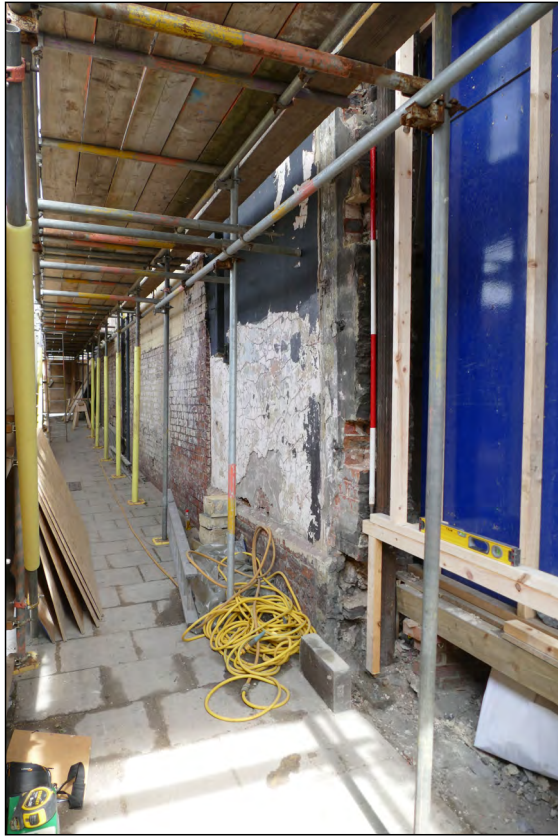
Ground floor exterior, view looking NNW from near the SW corner.
